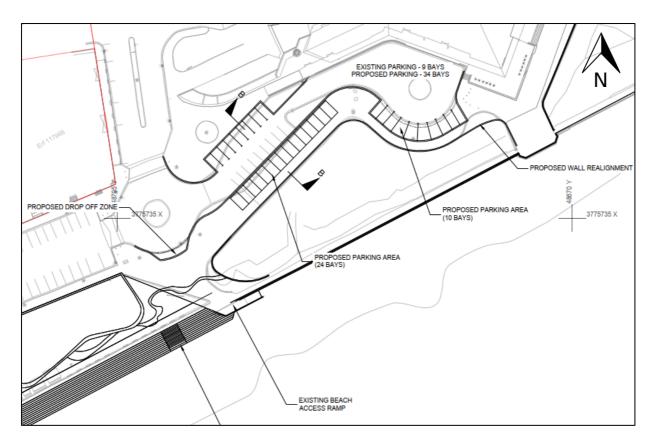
Proposed Parking Layout - Additional parking bays vicinity of Muizenberg Civic Centre
